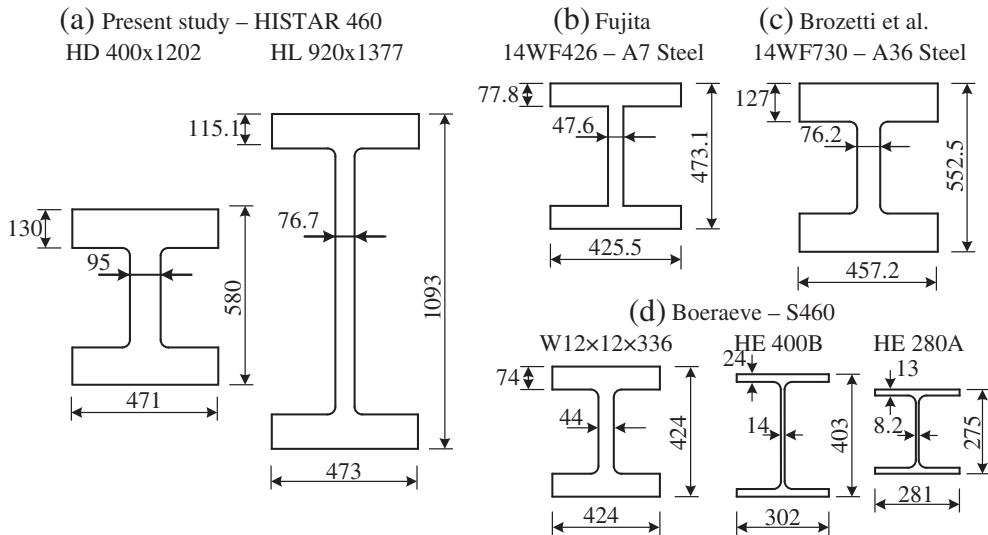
Rolled shapes with nominal section dimensions in mm.
